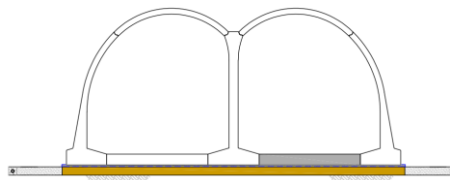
Above is an example of the double arch design we will be using for the Chipping Warden Green Tunnel.
